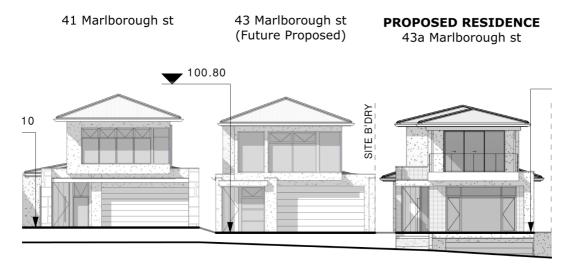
Streetscape elevation drawing portraying relationship of proposed dwelling with adjacent two-storey dwelling currently under construction
